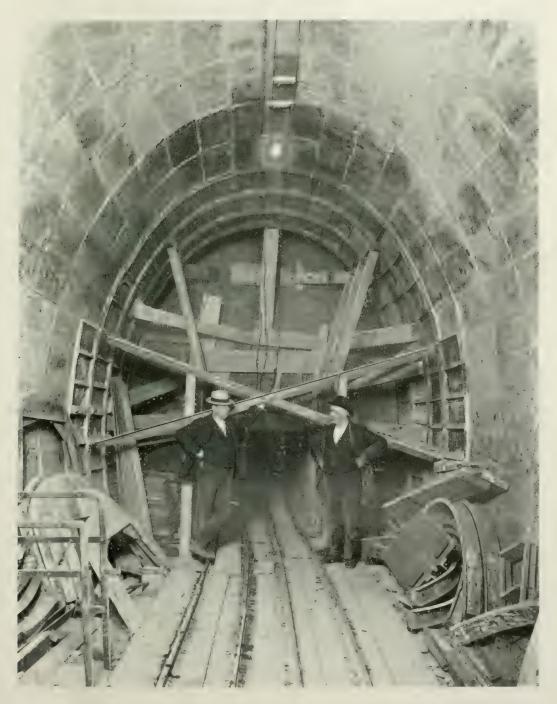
VIEW OF TRUNK CONDUIT UNDER CONSTRUCTION.
